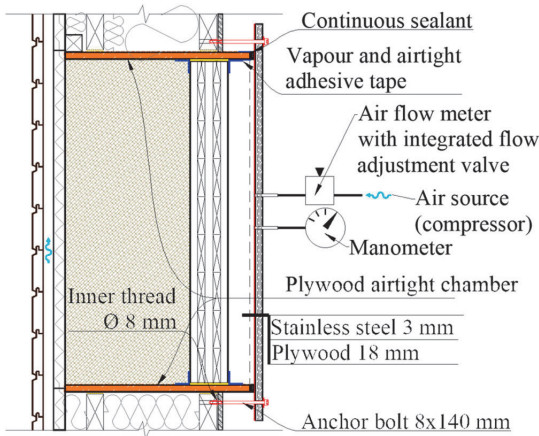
Equipment kit scheme for carrying out the air permeability test (left).
